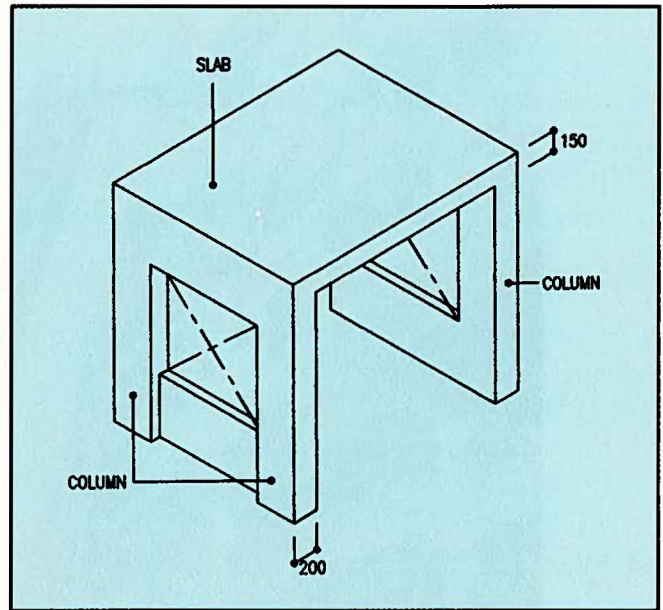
System 1 modified N Volumetric consisting of two column frames with linking slab elements.
